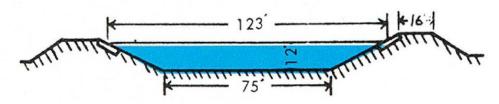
Earthen Embankment Canal Section: Erie Canal – Three Rivers to Tonawanda and Champlain Canal
